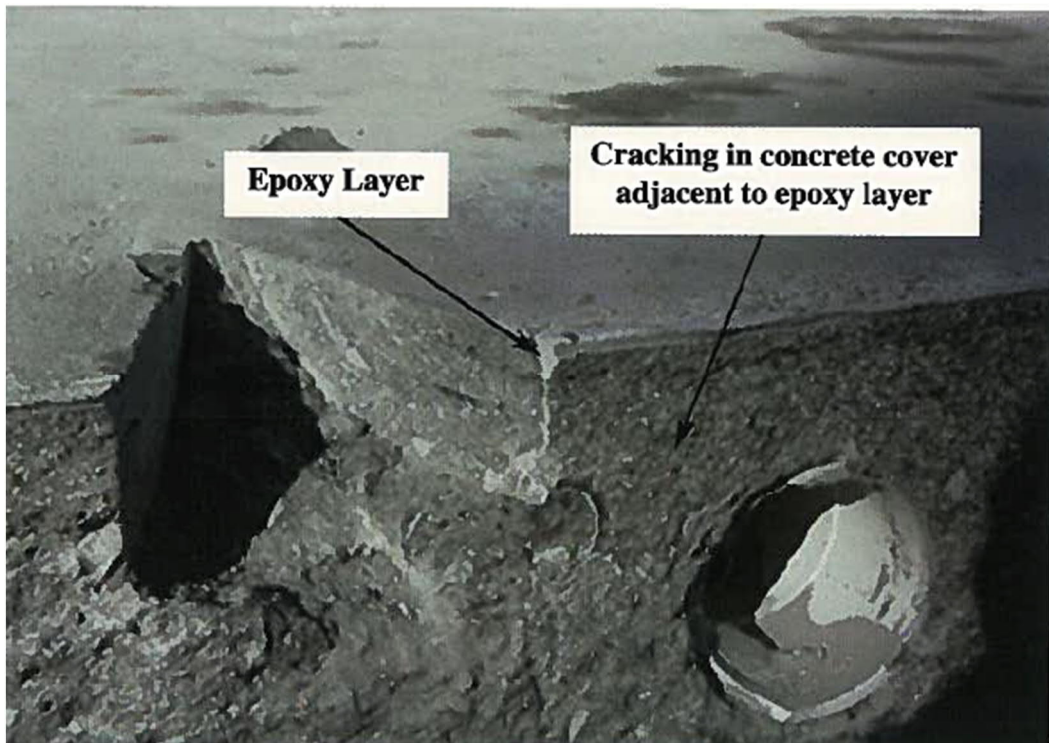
Failure of concrete adjacent to the epoxy joint under seismic loading, without any crossing reinforcement (Megally et al., 2002)
